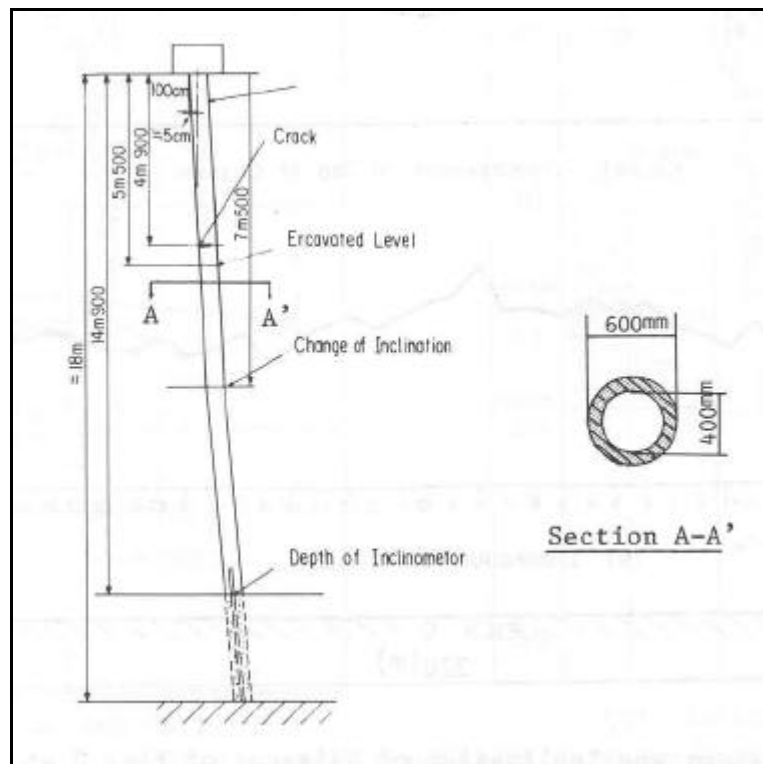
Damaged piles in Gaiko warehouse after 1983 Chubu earthquake after Hamada (1992b).
